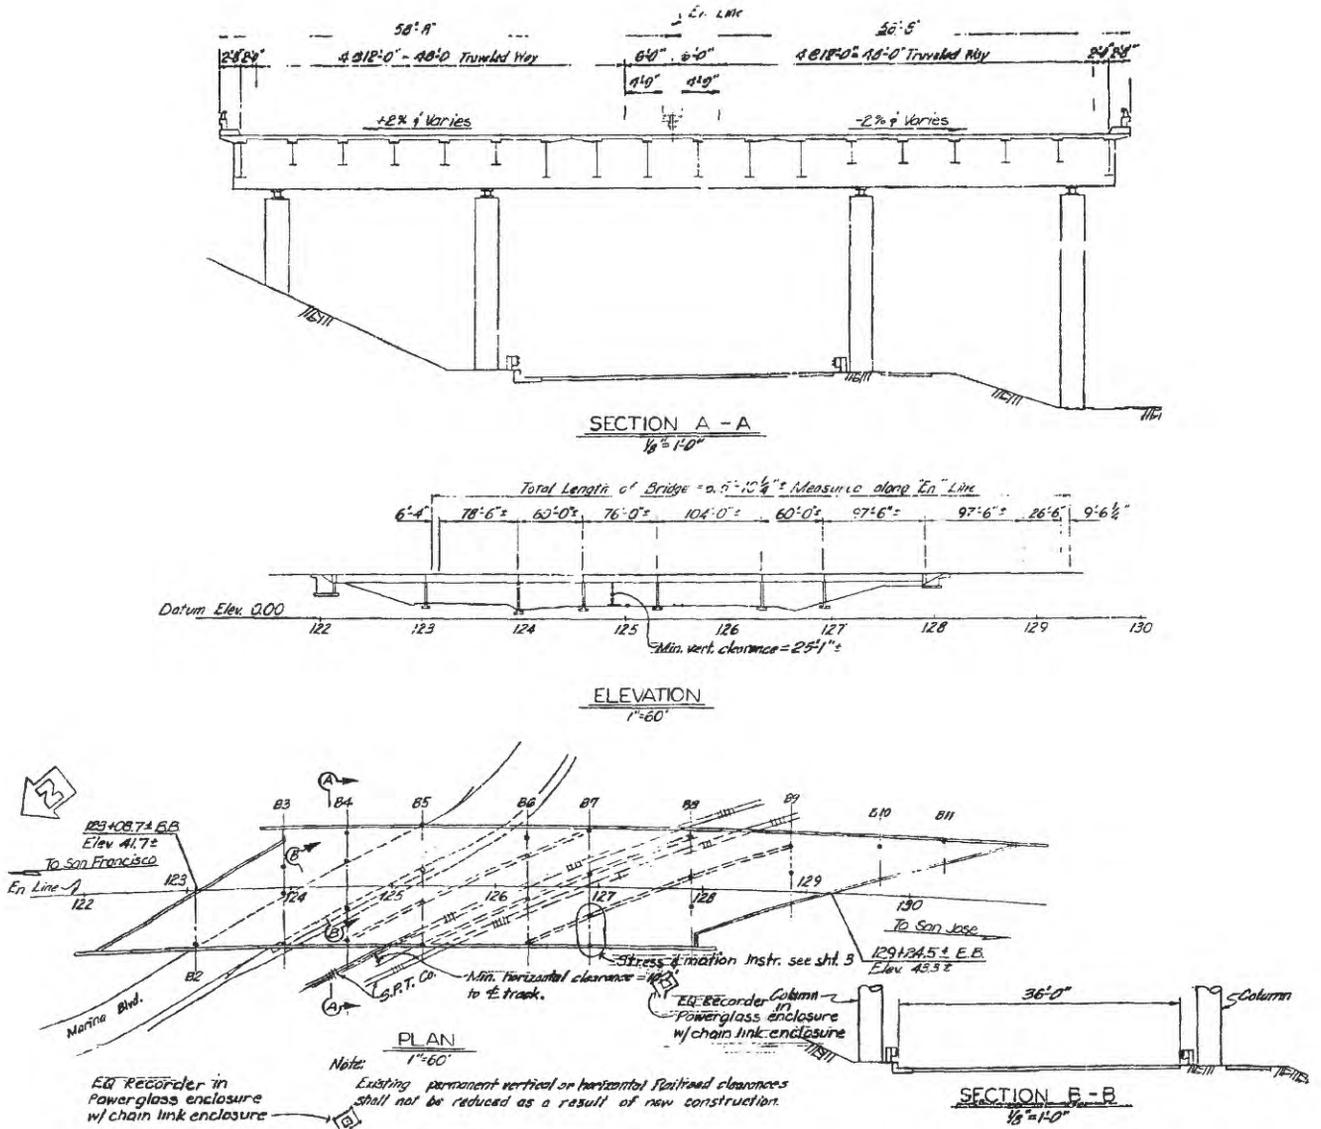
General Plan drawing for seismic retrofit of Sierra Point Overhead.
